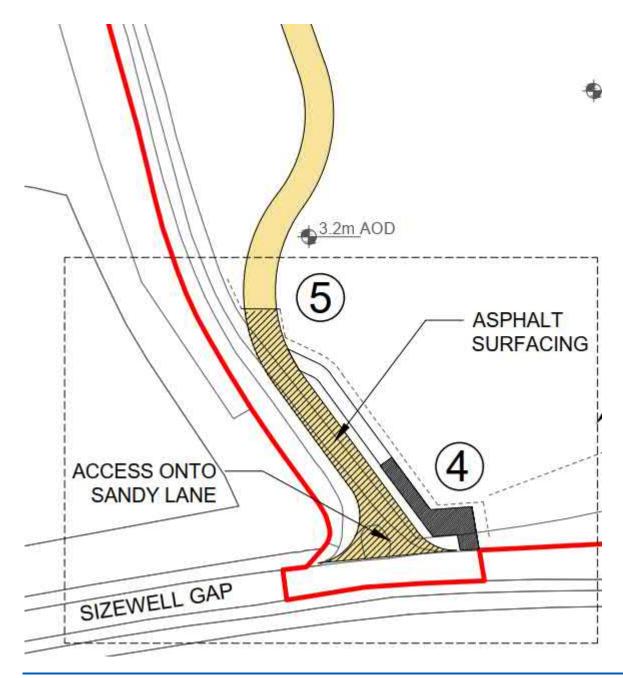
Sizewell Gap / Sandy Lane Road Junction and Route of Outage Car Park Access Track
